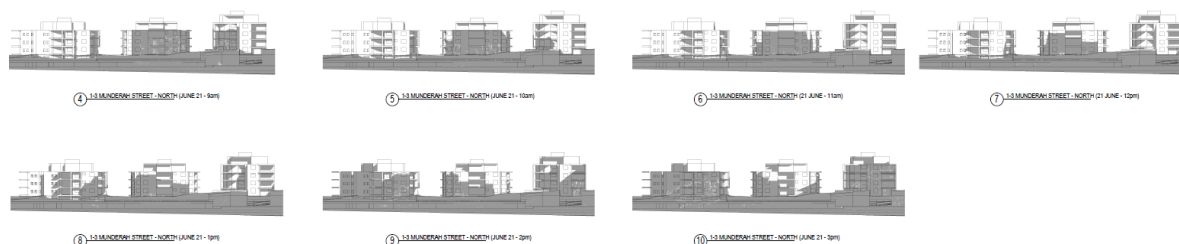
Proposed solar impacts 21 June on 1-3 Munderah Street (North)
